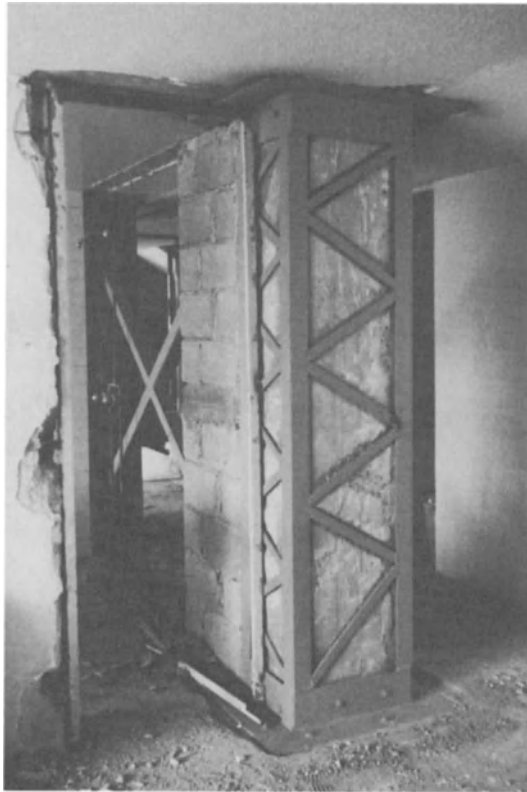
Reinforced columns, using four angles at corners joined with plates
